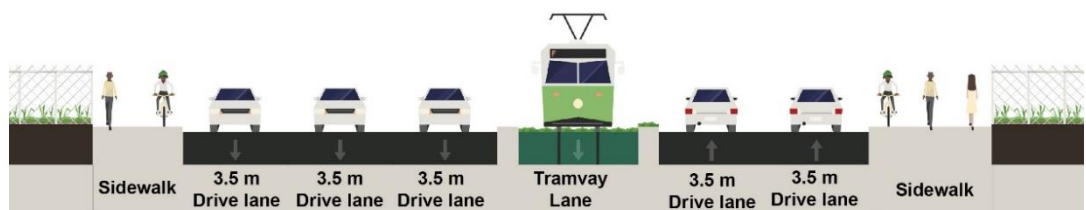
Liman Street pedestrian shared bicycle road section (via Streetmix)
